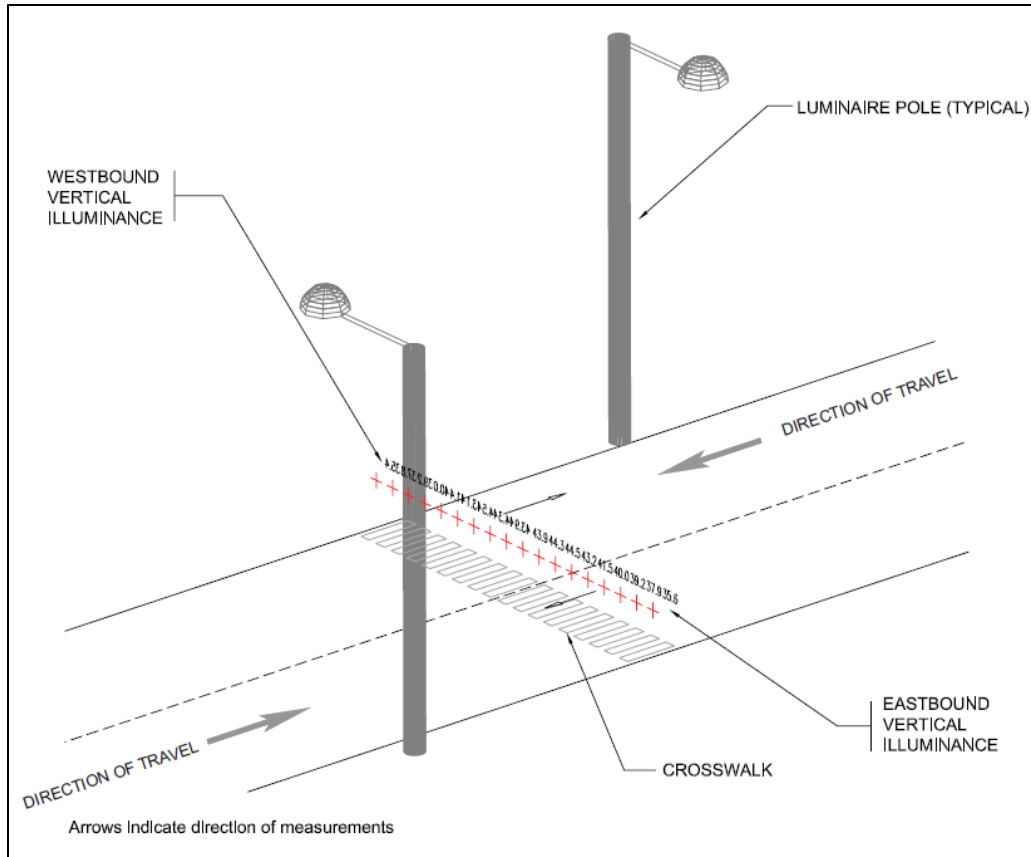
Typical Midblock Lighting Pole Placement (Source: TAC Roadway Lighting Guide)
